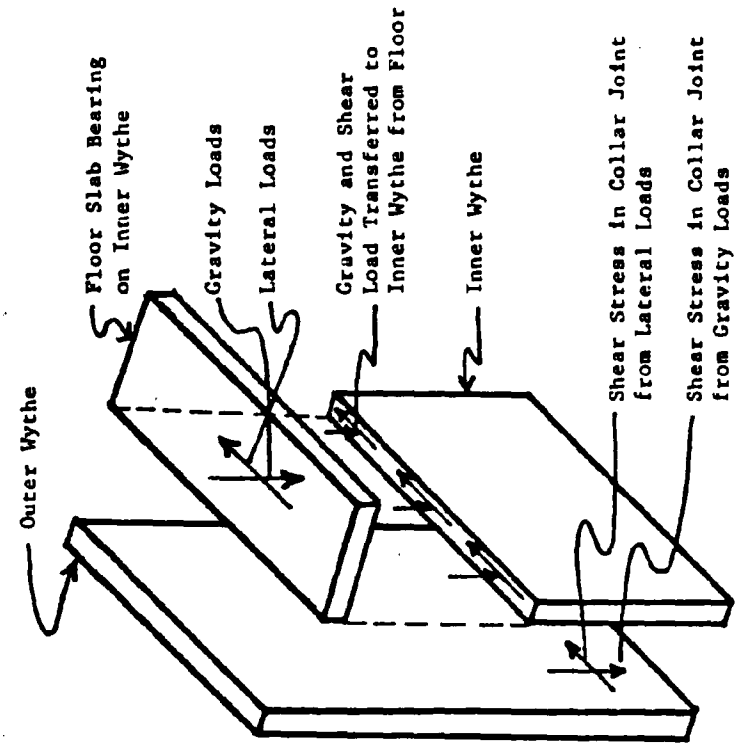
Load Transfer from Slab Bearing on Inner Wythe of a Composite Wall
